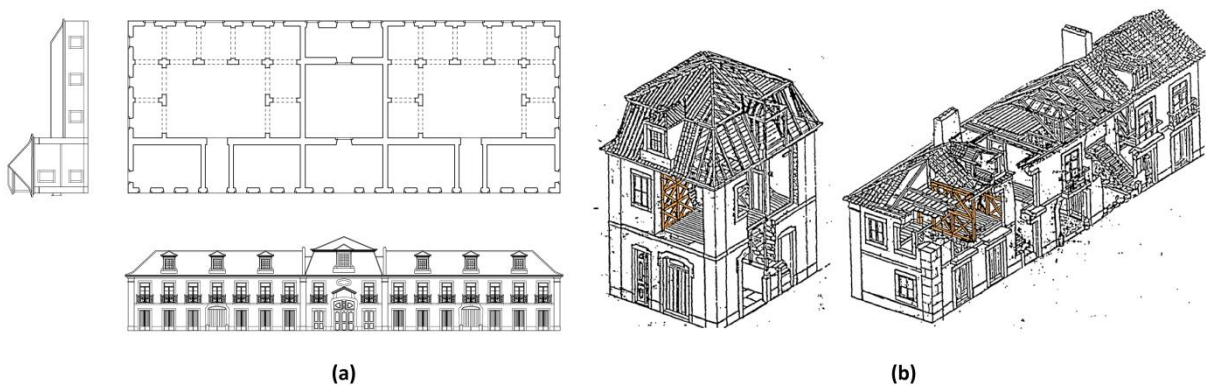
(a) Detailed CAD plans of the different original building types are available; and (b) extensive information on the construction details of the different building types (Mascarenhas 1996). The use of *frontal* walls in the two-story buildings of VRSA is highlighted
